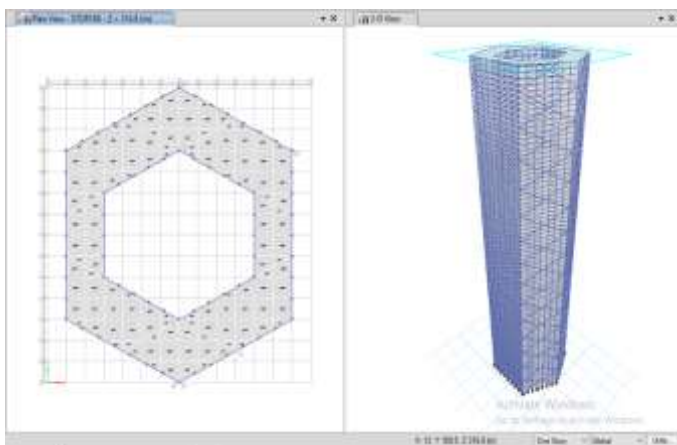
Framed Tube Structure with bracings: Hexagonal in Plan
